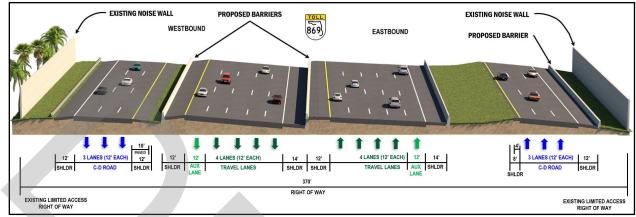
(c) - Preferred Alternative Roadway Section of SR 869 between Lyons Road and Florida's Turnpike
